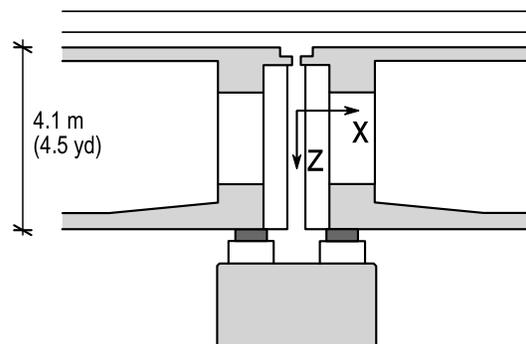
Profile of a part of the secondary bridge, cross section and longitudinal section
